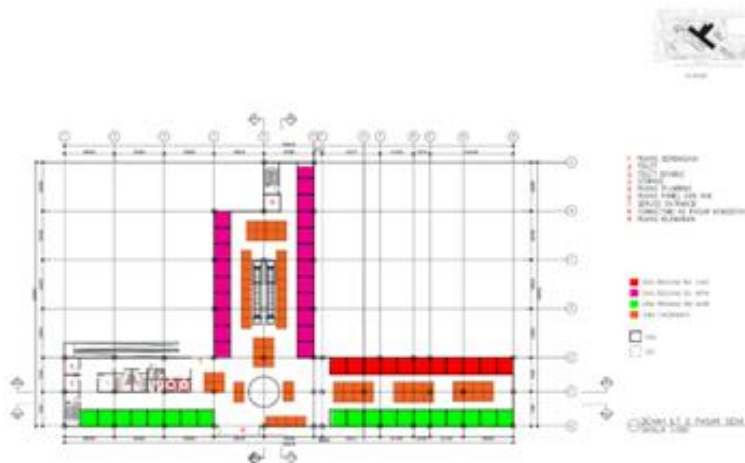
Floor Plan of Art Market and Art Space 2nd Floor
